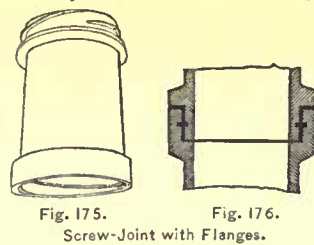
Fig. 176. Screw-Joint with Flanges.
